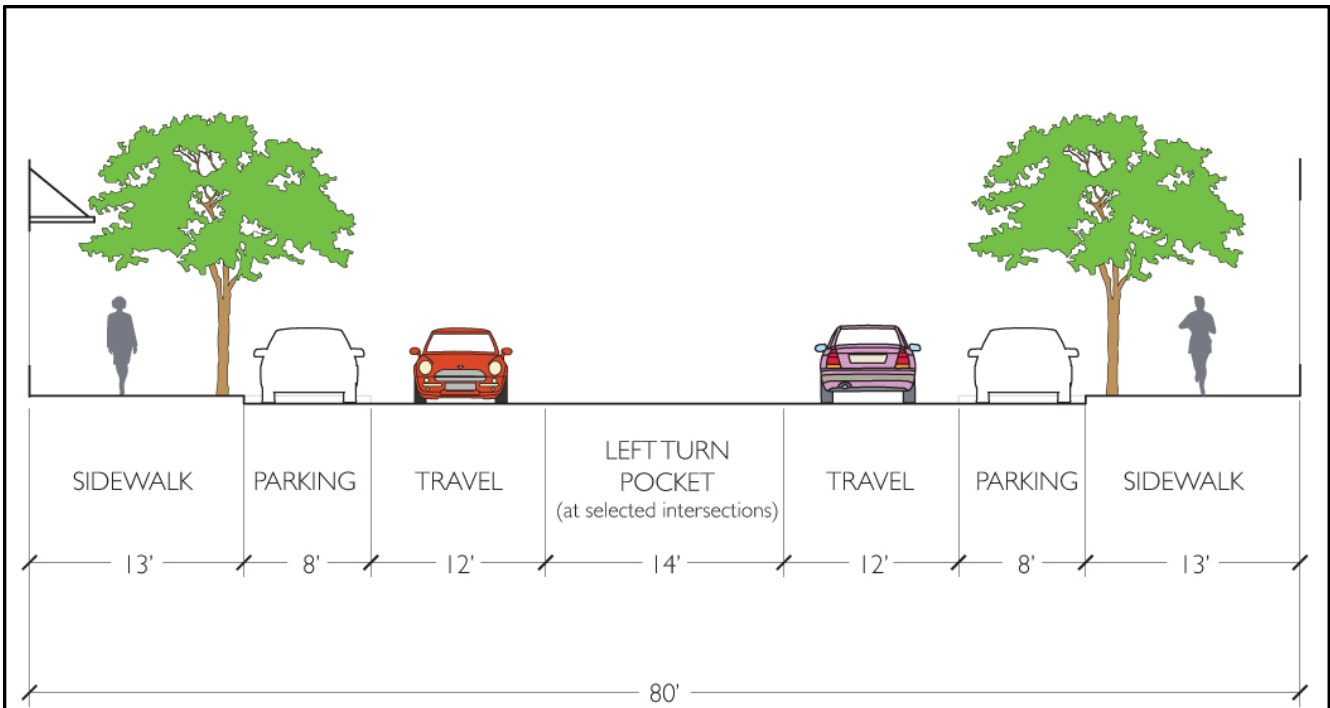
Typical West Broadway Avenue Section (for illustrative purposes only)
